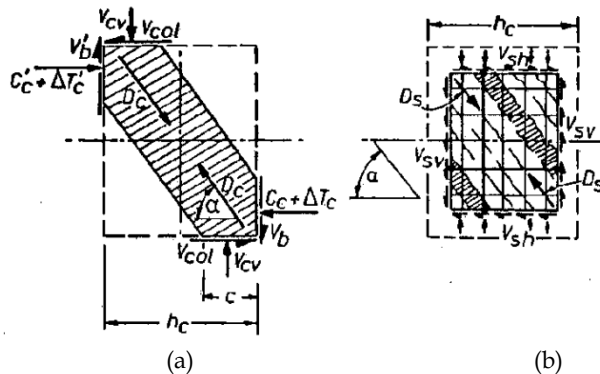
External actions and internal stress in the joint panel (Paulay and Priestley, 1992): diagonal strut (a); truss mechanism (b).
